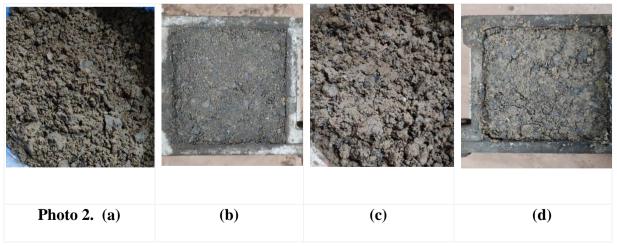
(a) shows preparation of FA concrete, (b) shows moulding of FA concrete cube, (c) shows preparation of GGBFS concrete, (b) shows moulding of GGBFS concrete cube.
